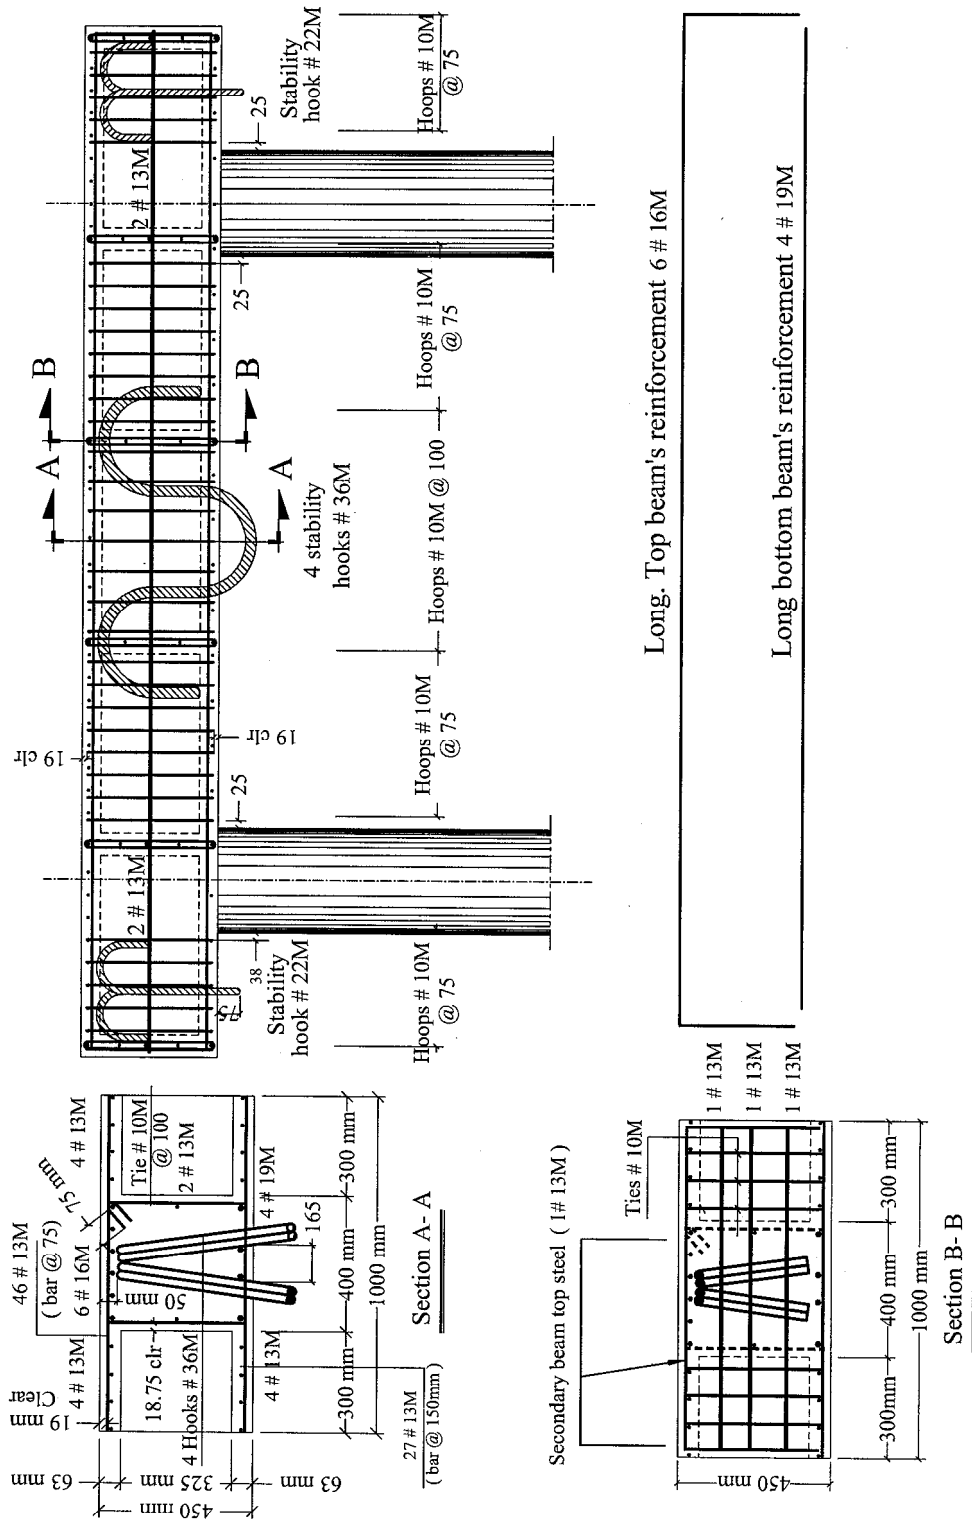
Details of Beam Reinforcement of Specimen B2CS, (SI Units)
